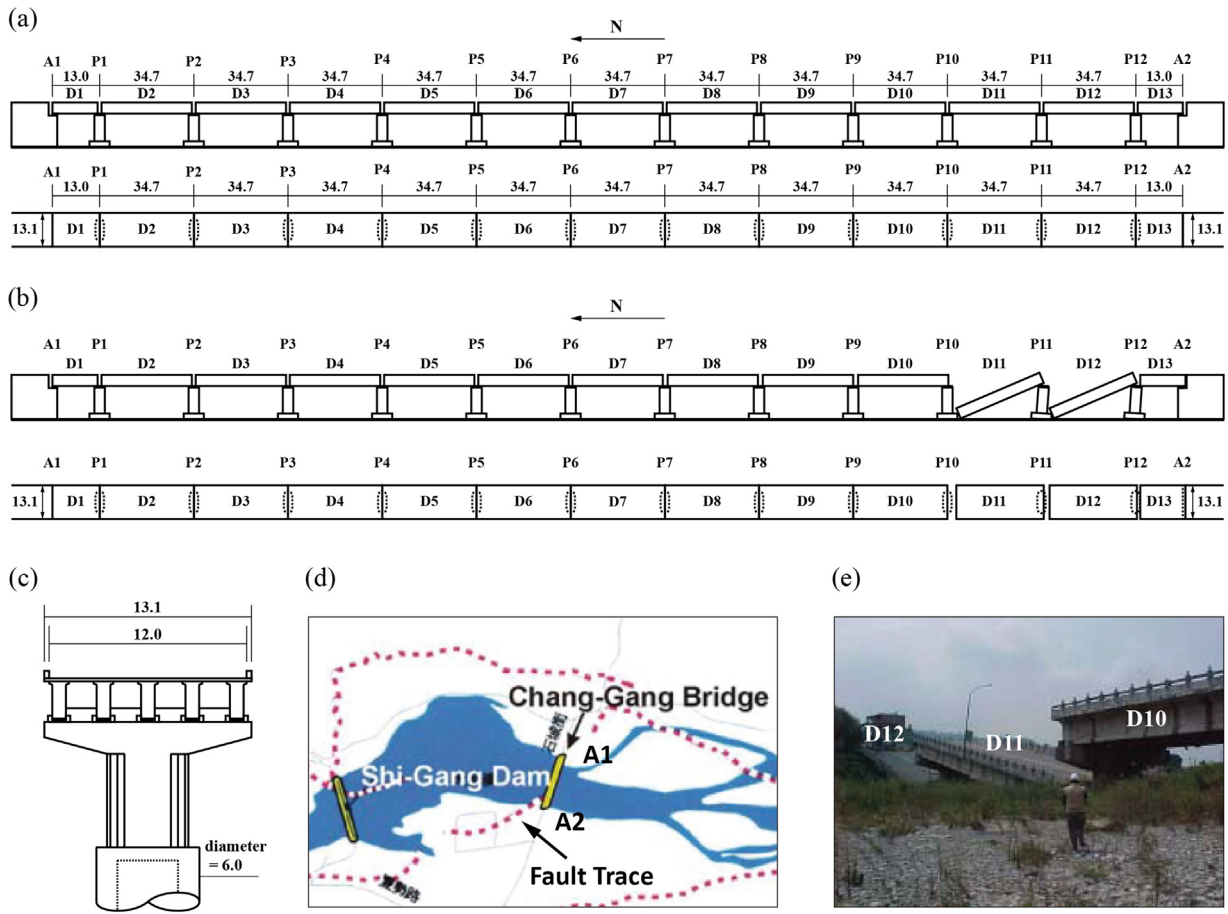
Chang-Gang Bridge during the 1999 Chi-Chi earthquake: (a) elevation and plan views of original bridge (unit: m); (b) elevation and plan views of collapsed bridge; (c) typical section of bridge (unit: m); (d) map showing bridge crossed by surface fault rupture; (e) two collapsed spans near southwest abutment (Fig. 12a and b is generated based on information provided by Tasaki et al. [119]; Fig. 12d is modified from Buckle and Chang [15]; Fig. 12e is modified from Bray [12]).
